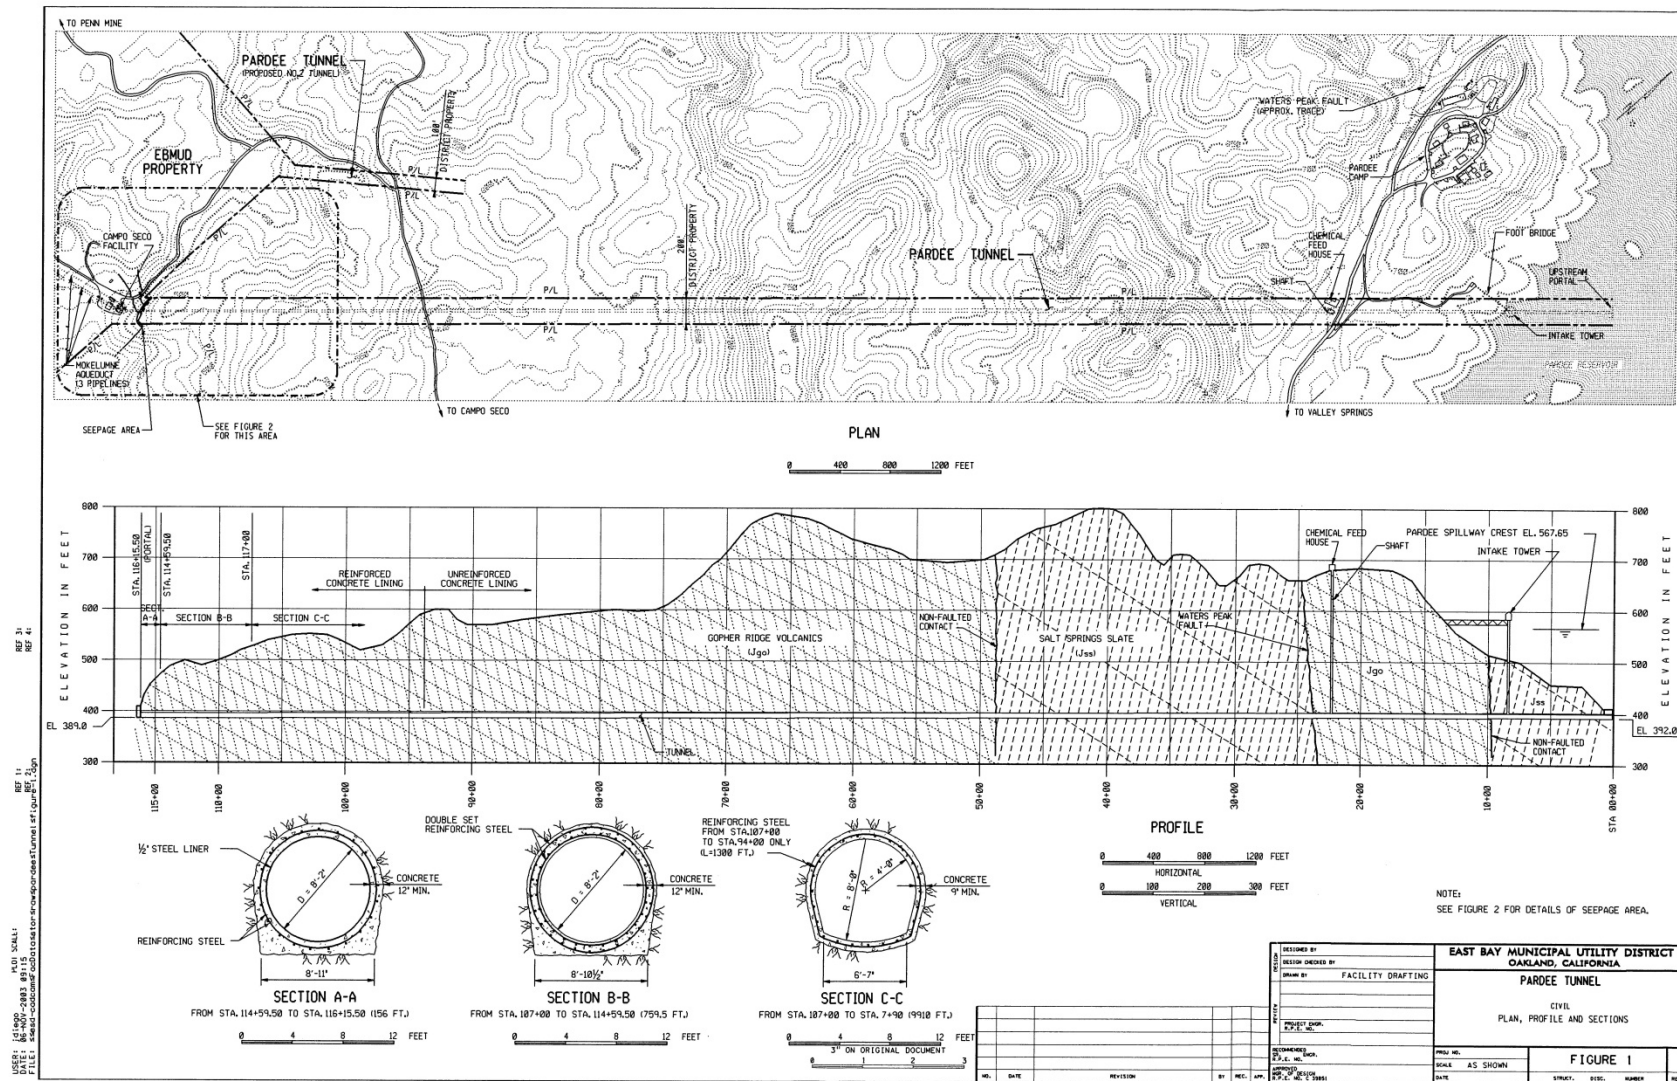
Pardee Tunnel: Existing Outlet Works Plan, Profile, and Sections
